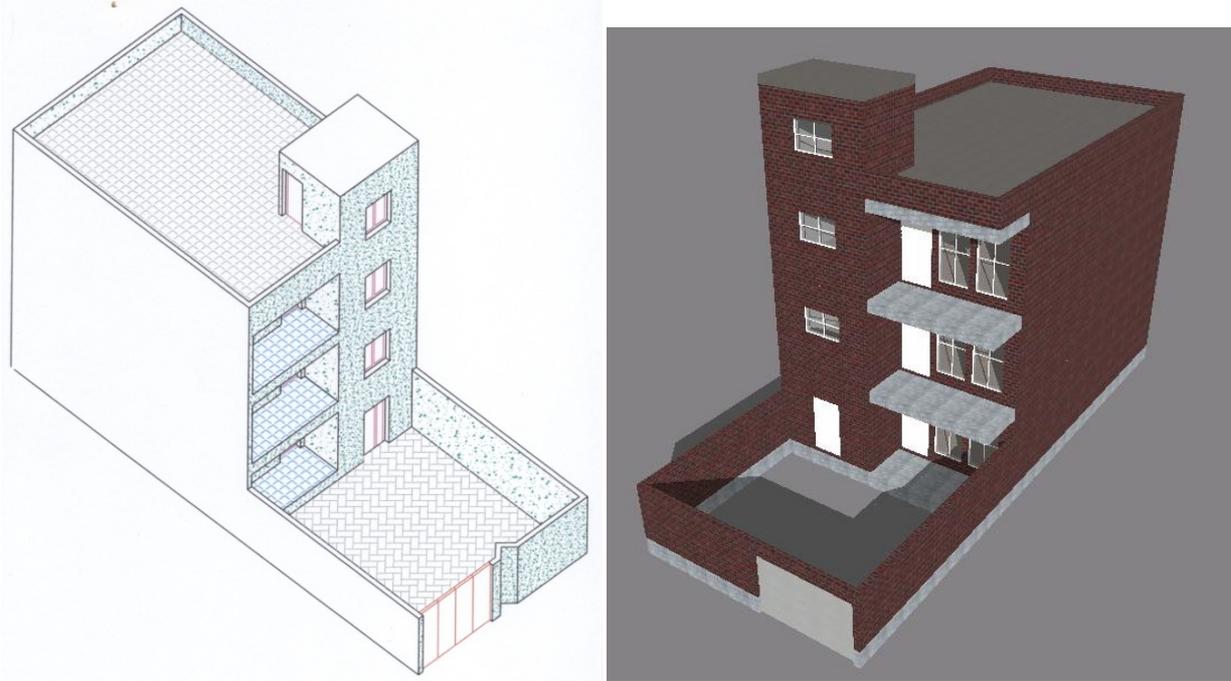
Aerial view of a typical new 3-story house in Tabriz
